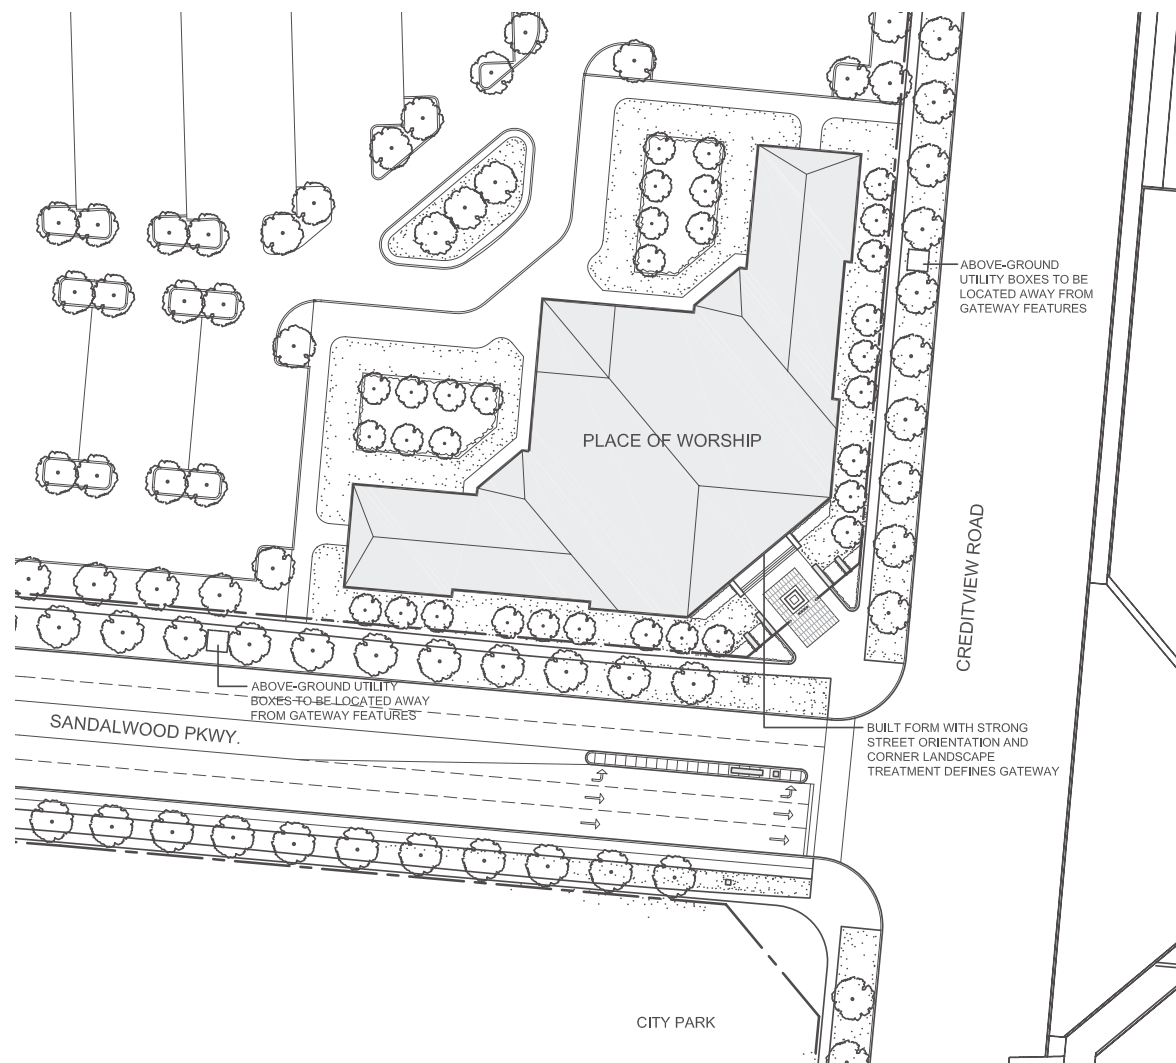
Conceptual plan illustrating Place of Worship site as community gateway through strong built-form presence and landscaped corner treatment.
